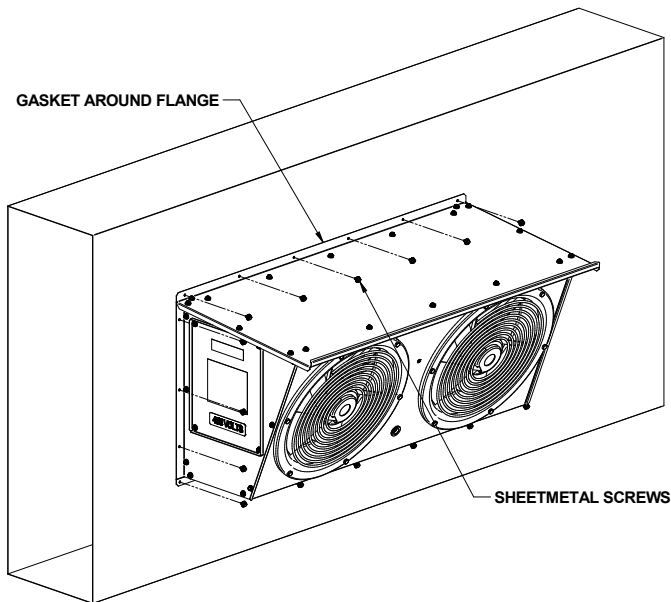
POWER EXHAUST INSTALLED ON DUCT
